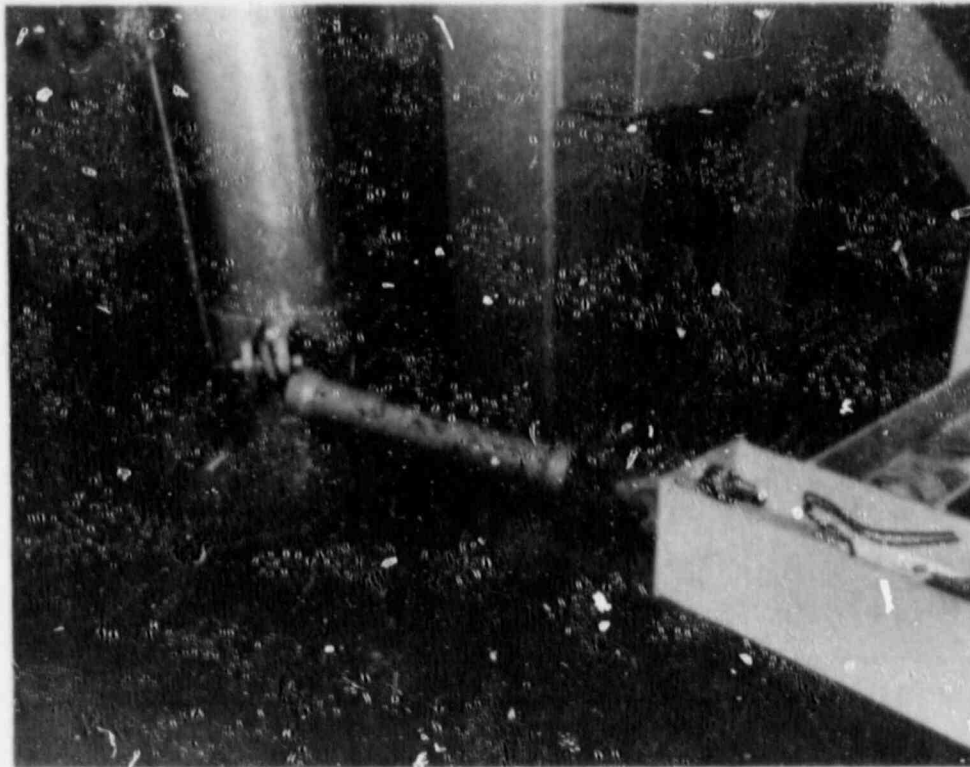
Buckled horizontal strut from 8-in. butterfly valve test.
